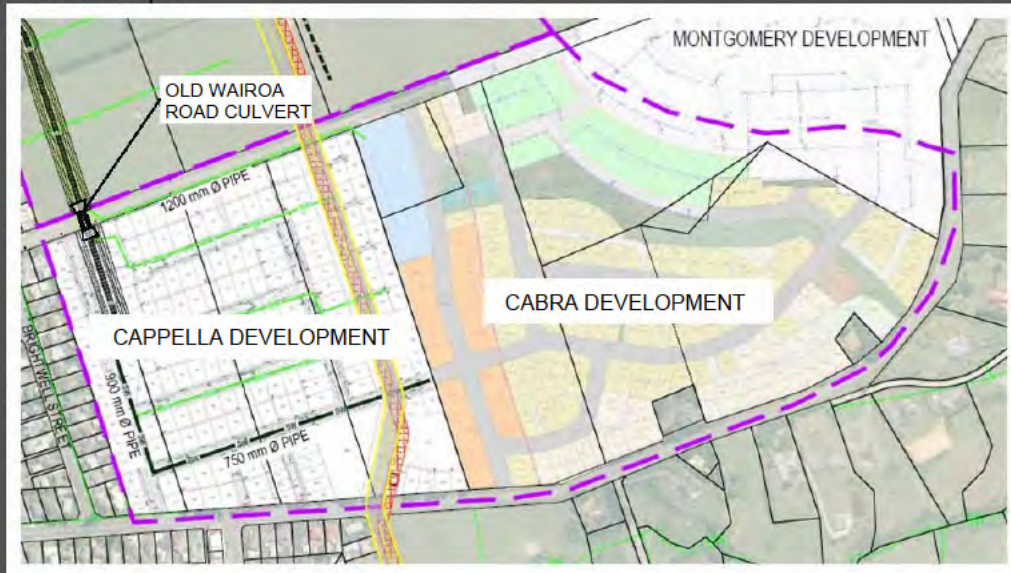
Old Wairoa Road Culvert location plan (Drawing 51-3217404-C310)
